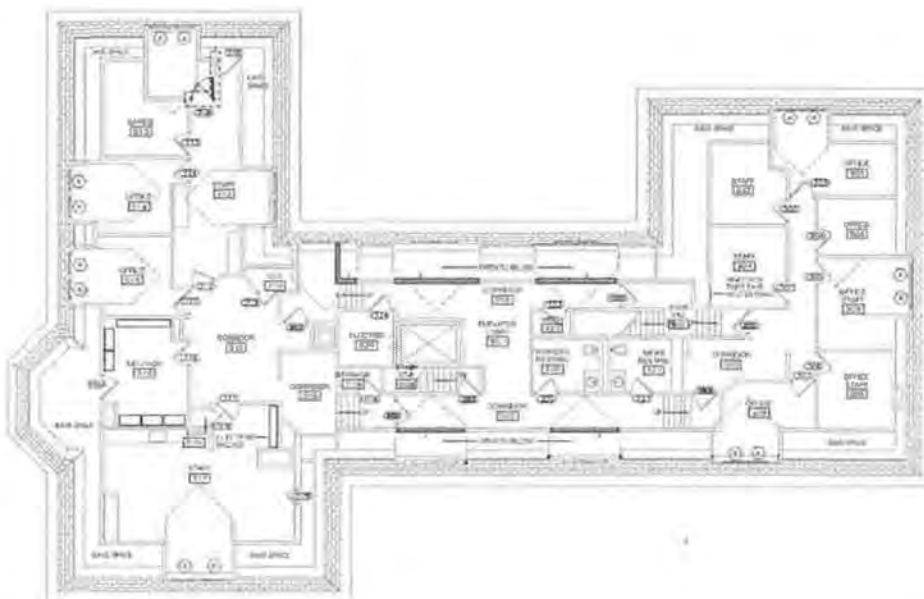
, Third-Floor Plan (2014, courtesy Cambridge Seven Associates)
